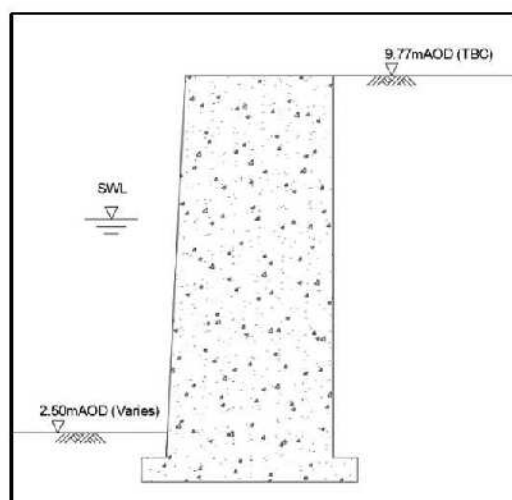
Illustrative sketch of a mass Concrete Gravity Retaining Wall (not to scale).
